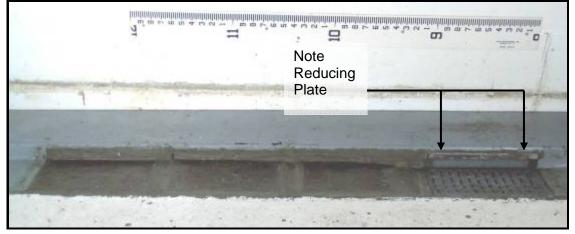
Single No. 16 with 4-in. Curb Opening Photograph
